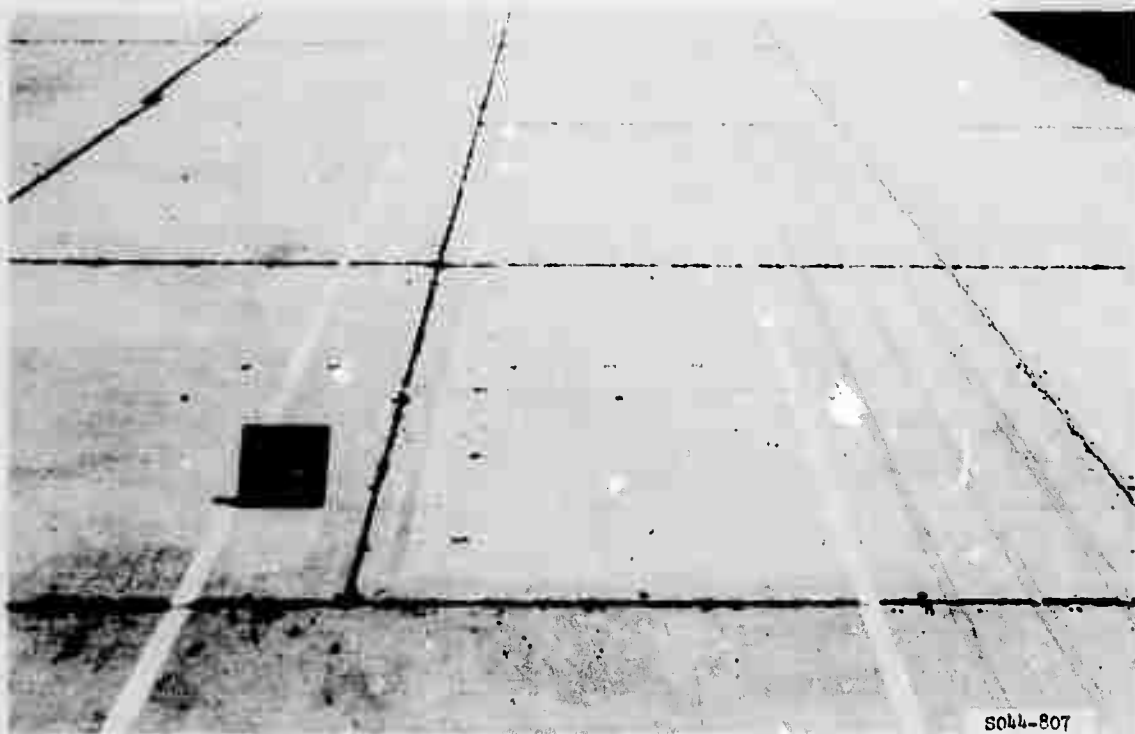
Item 5, lane 1, rigid pavement test section, prior to traffic
